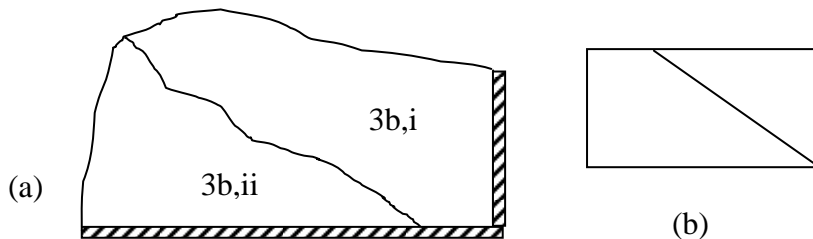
(a) Sketch showing three sub-panels of the grey wall after the first crack pattern occurred. (b) typical crack patterns in the case of conventional masonry.
